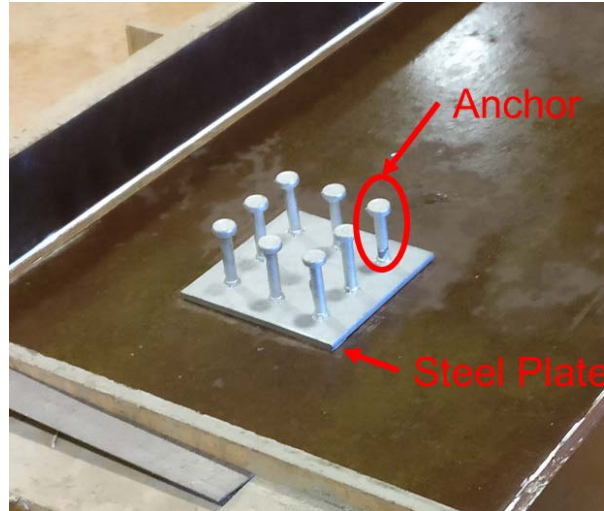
Embedded plate with welded headed stud anchors
